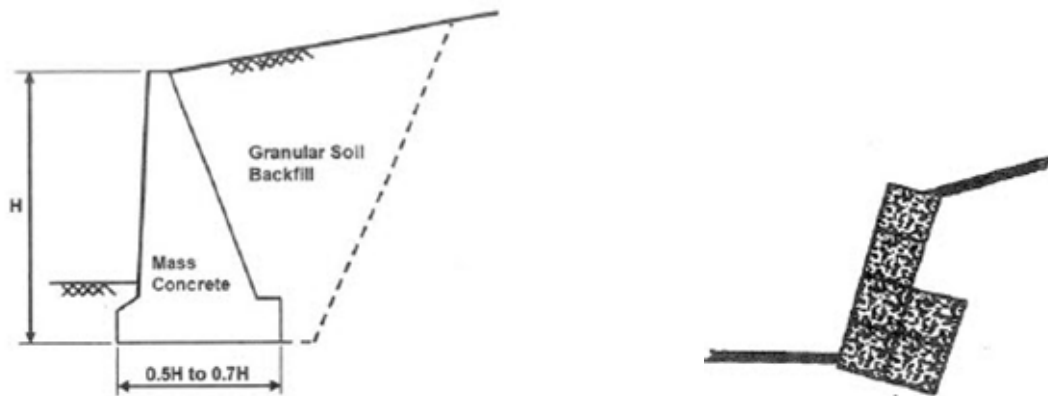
Gravity Mass Concrete Wall and Gabion Basket Wall (AASHTO LRFD, November 2017)
